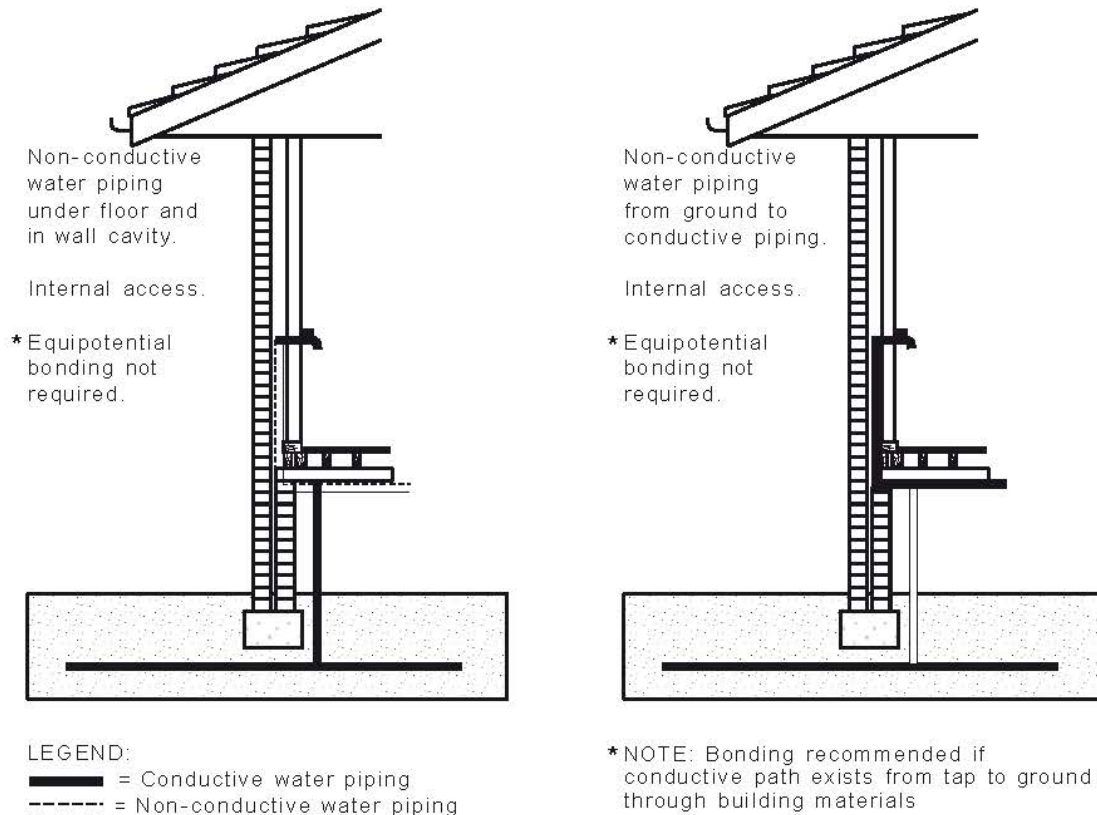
EXAMPLES OF EQUIPOTENTIAL BONDING OF CONDUCTIVE WATER PIPING (WITH EXCEPTION)
